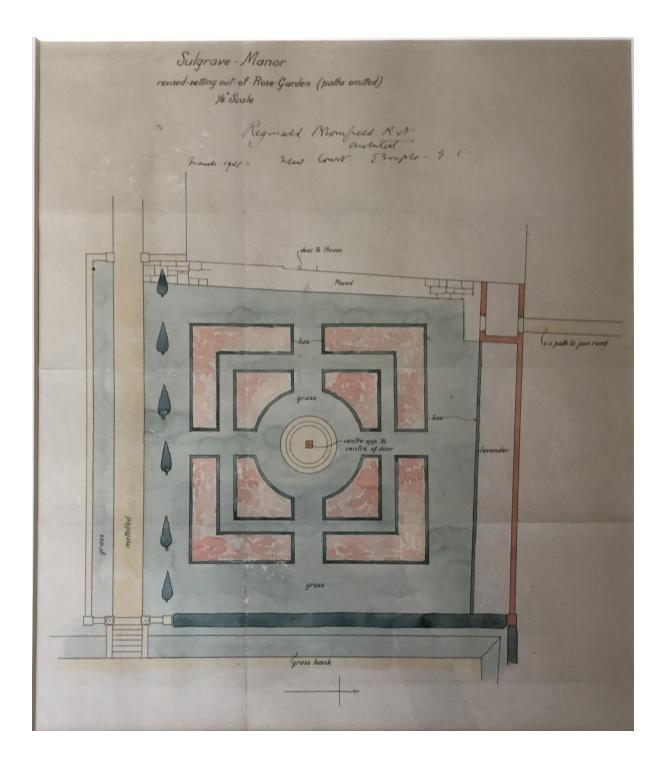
The Rose Garden plan, March 1928. Sulgrave Manor & Garden.
